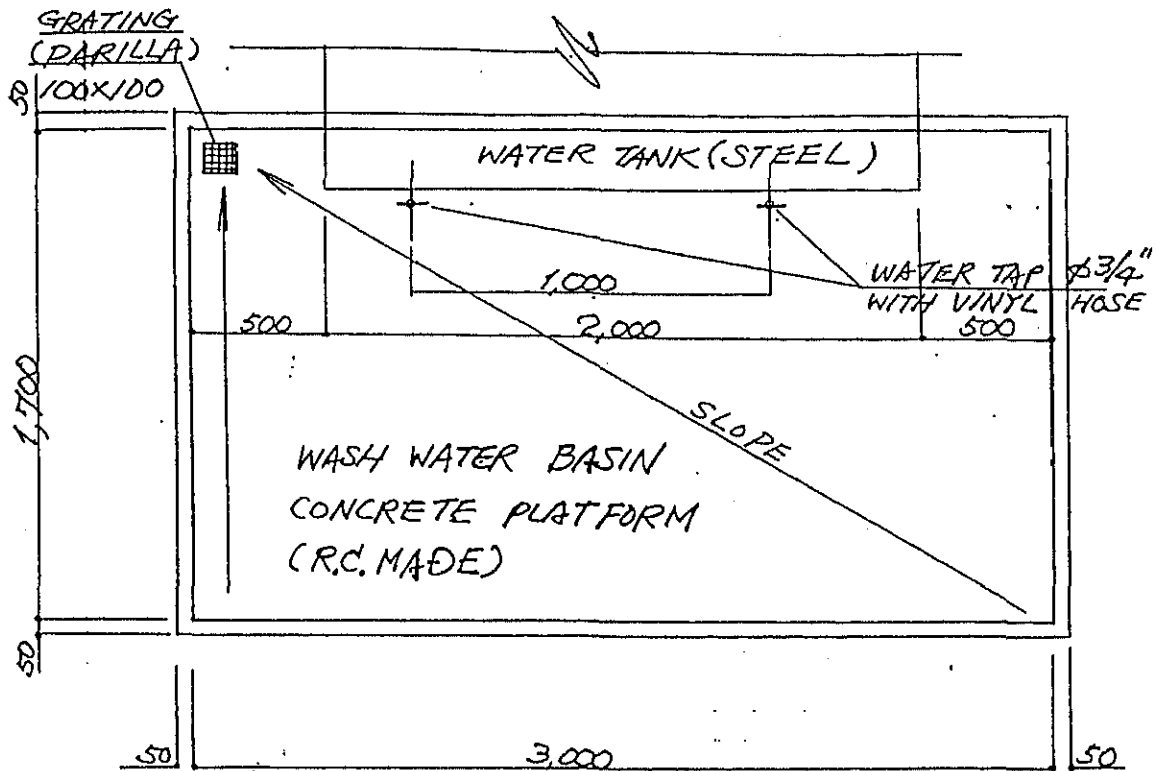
INSTALLATION OF WATER TANK - ROOF TOP PLAN -
